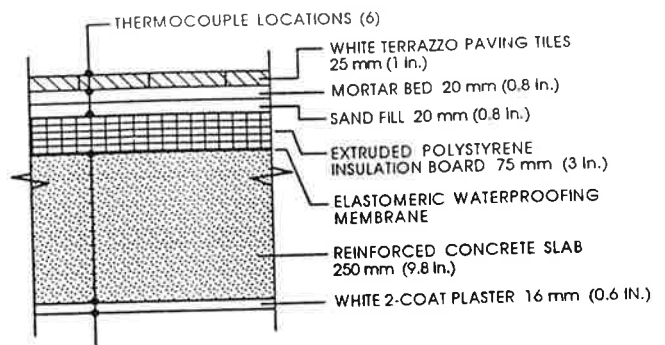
Roof 4: protected membrane (extruded polystyrene) concrete slab.
